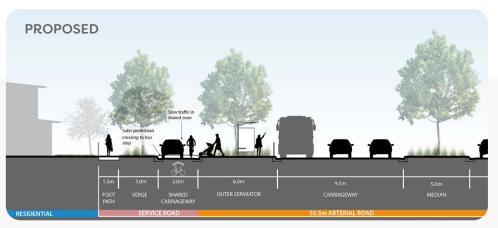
An example of a reconfigured service road, that could be utilised at key locations where pedestrian crossing movement should be prioritised - this example would provide traffic calming through a narrowed pavement, kerb outstands, line marking, and increased pedestrian activity.
